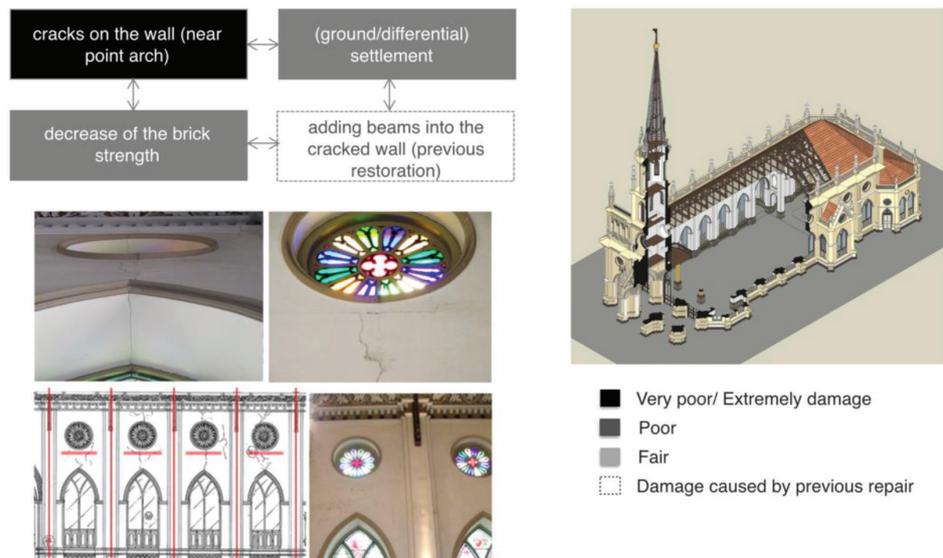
Group B: The problems of ground/differential settlement and decrease of brick strength, have caused extensive cracks on the wall area between point-arched windows and rose windows
